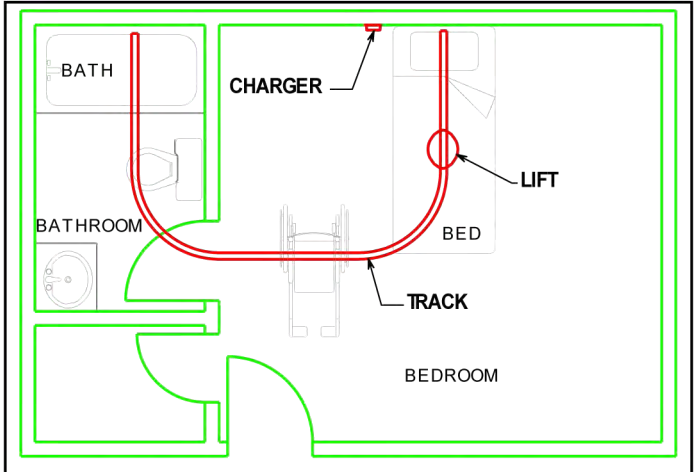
B - Alternate sample floor plan showing basic components of a ceiling lift system.
